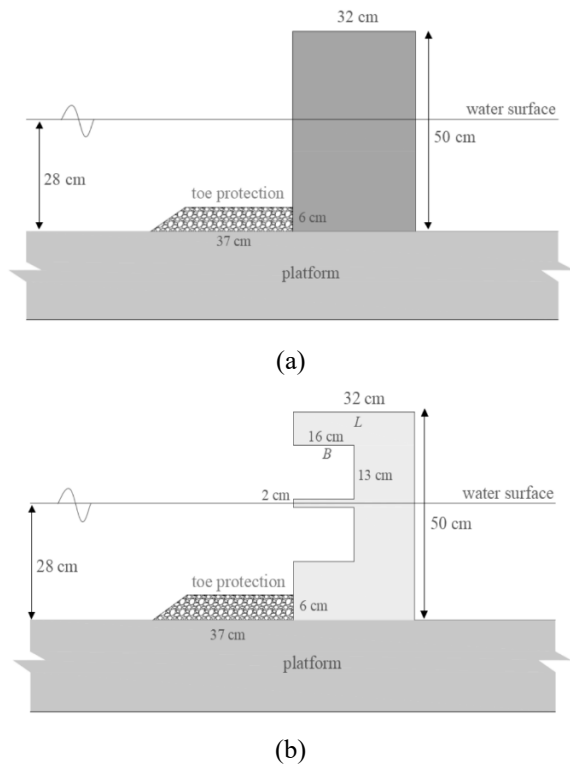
Cross section of the structure for (a) vertical wall and (b) split chamber
